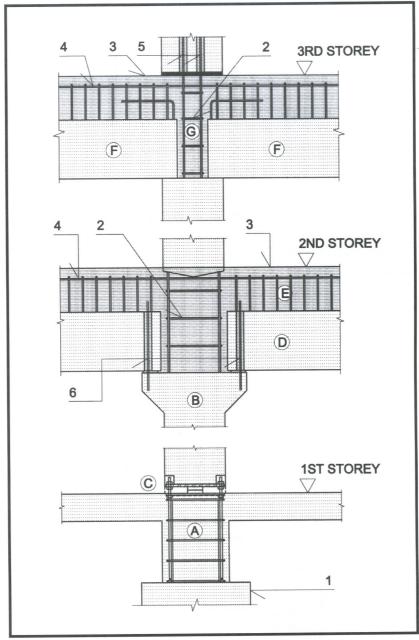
Illustration Example For Column/Stump, Column/Column And Column/Beam Connection
